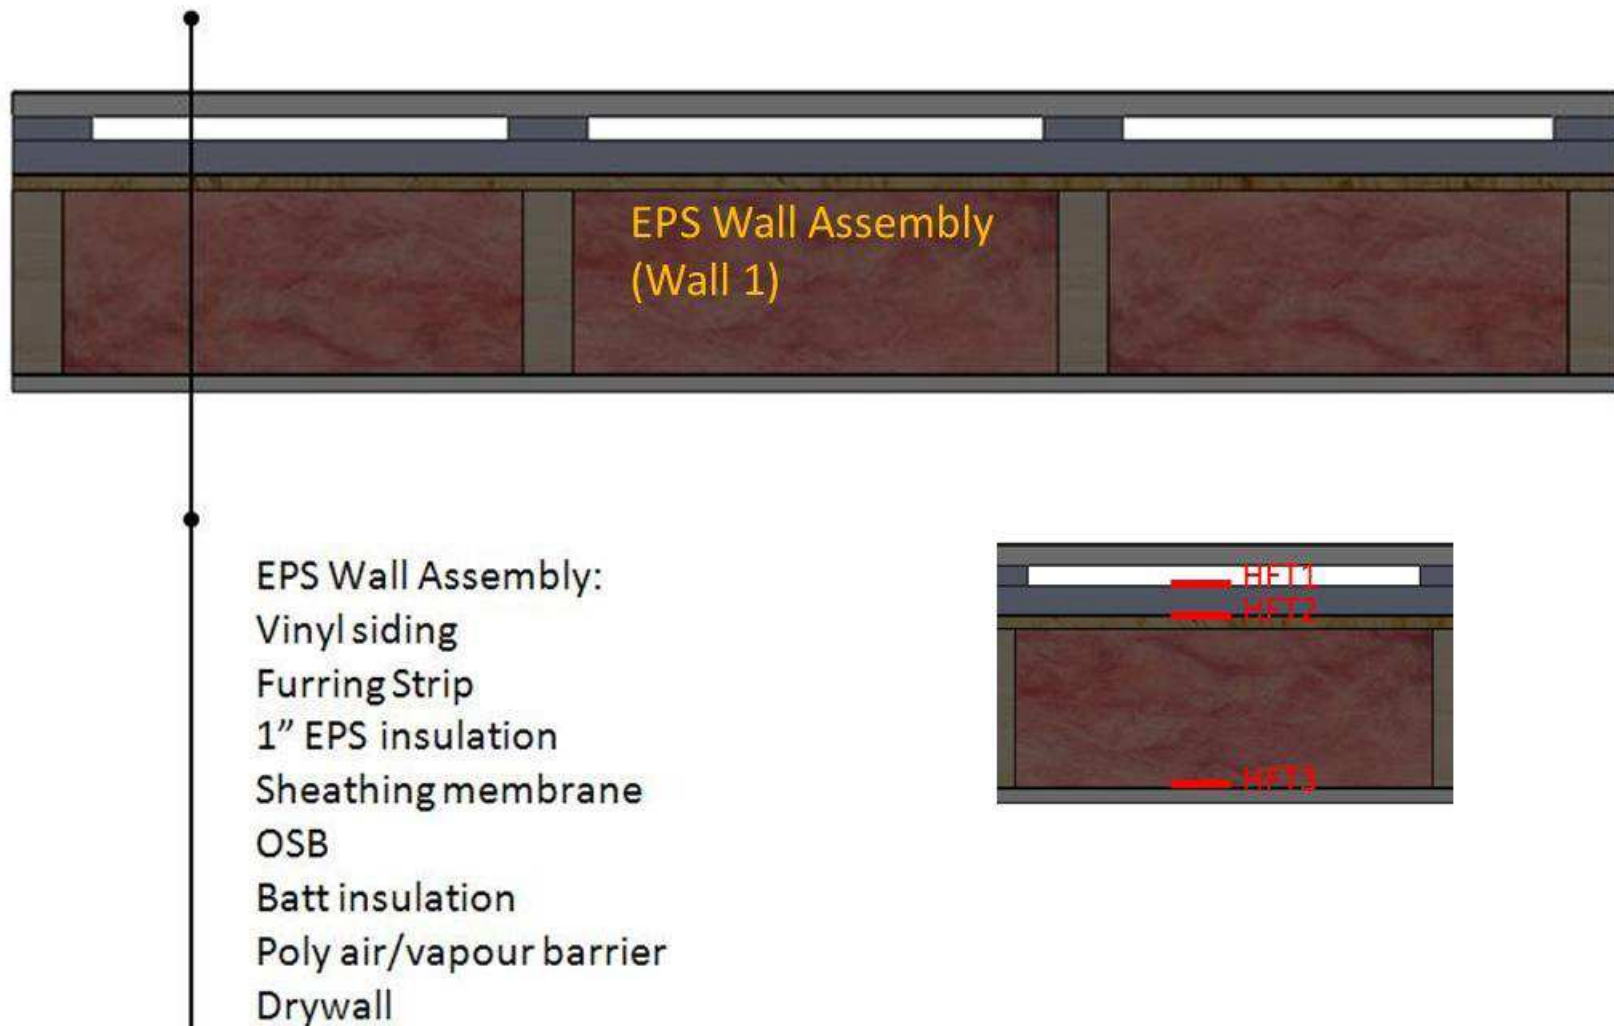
Horizontal cross-section through EPS wall assembly showing locations of Heat Flux Transducers, HFTs (Wall 1)
